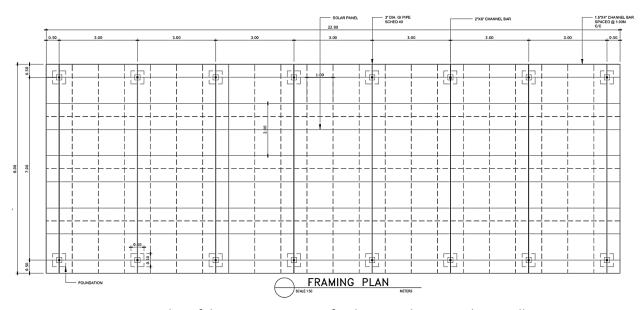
Framing plan of the structure support for the ground mount solar installations.
